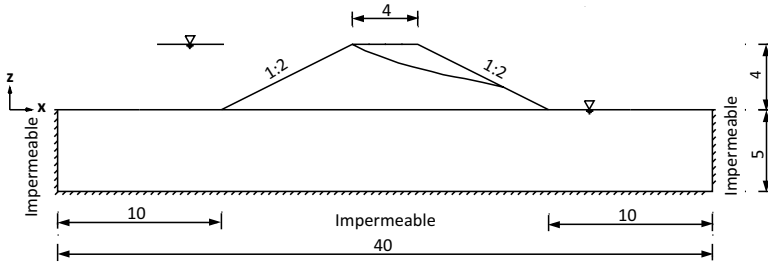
Geometry of the embankment and foundation (dimensions in m).
